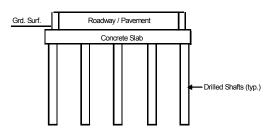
Elevated Slab-on-Piles (SOP) Design Concept.
